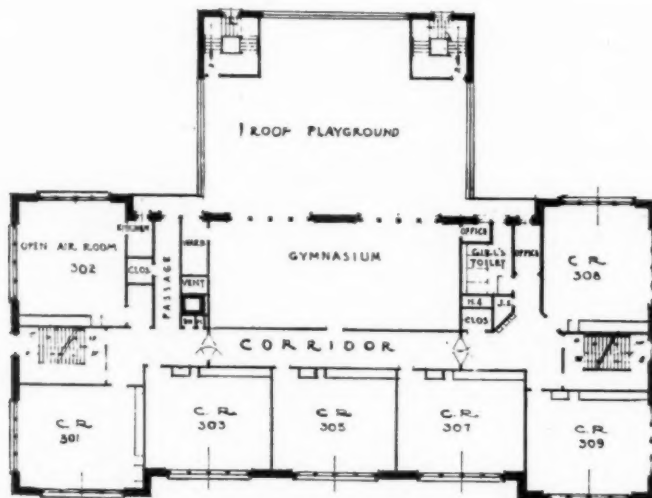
THIRD FLOOR PLAN. TYPE "C" ELEMENTARY SCHOOL
